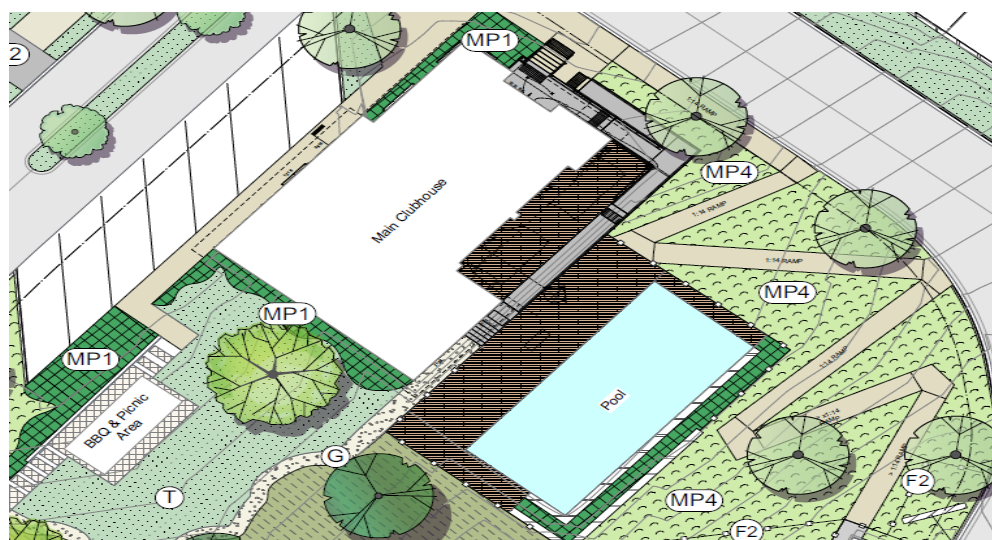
proposed part community facilities – moir studio , Landscape Plan D
